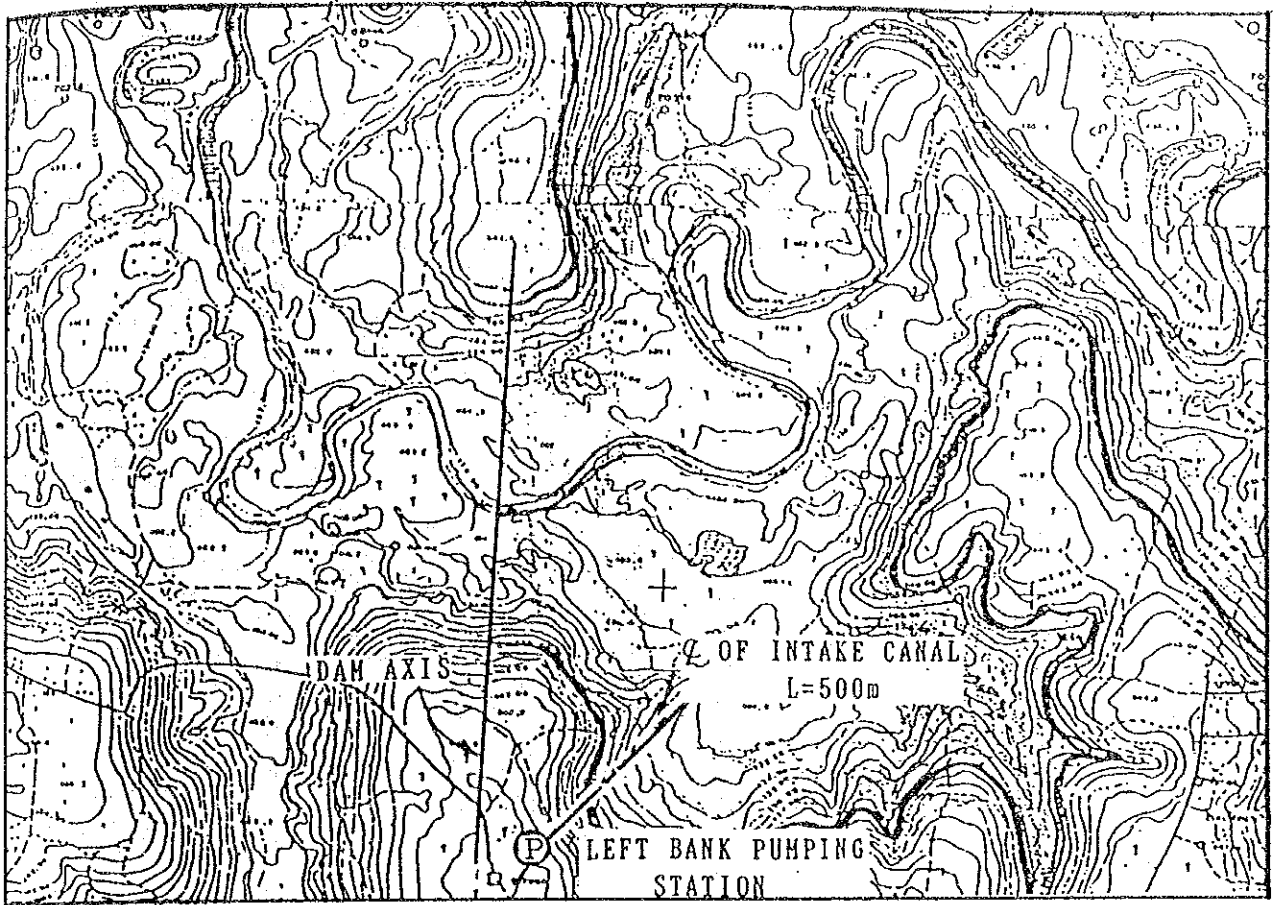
indicates the location map of both pumping stations and intake channel to be constructed, and also plan of pumping stations are shown in Attached Drawing No.6 (Left bank) and No.7 (Right bank).
